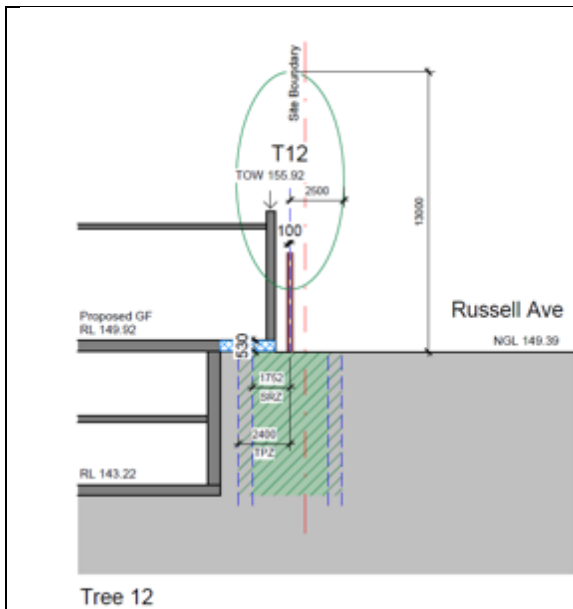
Cross section Tree 12 – construction works including a suspended slab (couter level) retain existing soil level.
